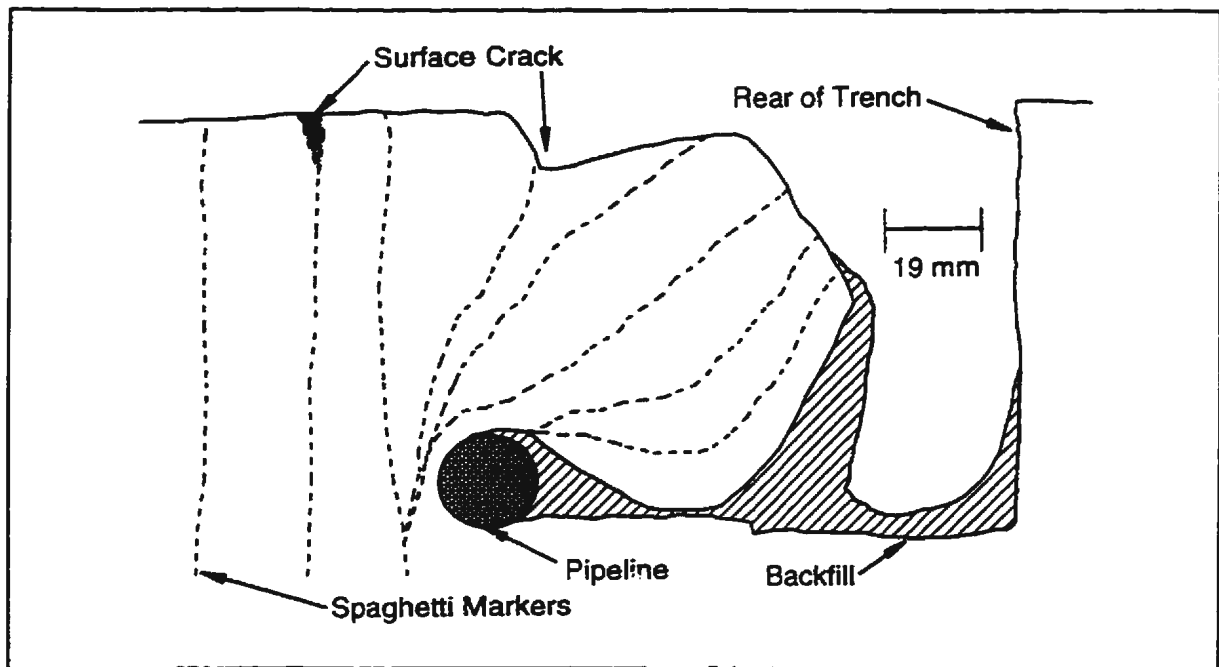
Sketch of excavated cross-section along mid length of model pipeline #1, 65mm cover, Test 02.
